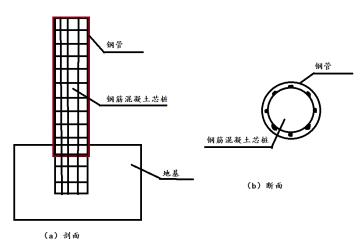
Section diagram of reinforced concrete rock-socketed pile
